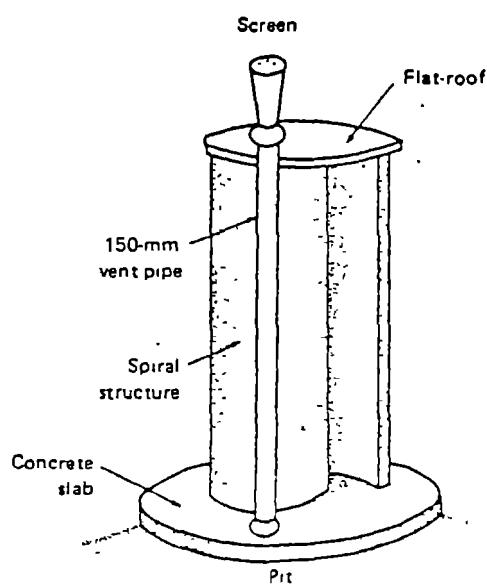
ventilated pit privy, as used in Zimbabwe
